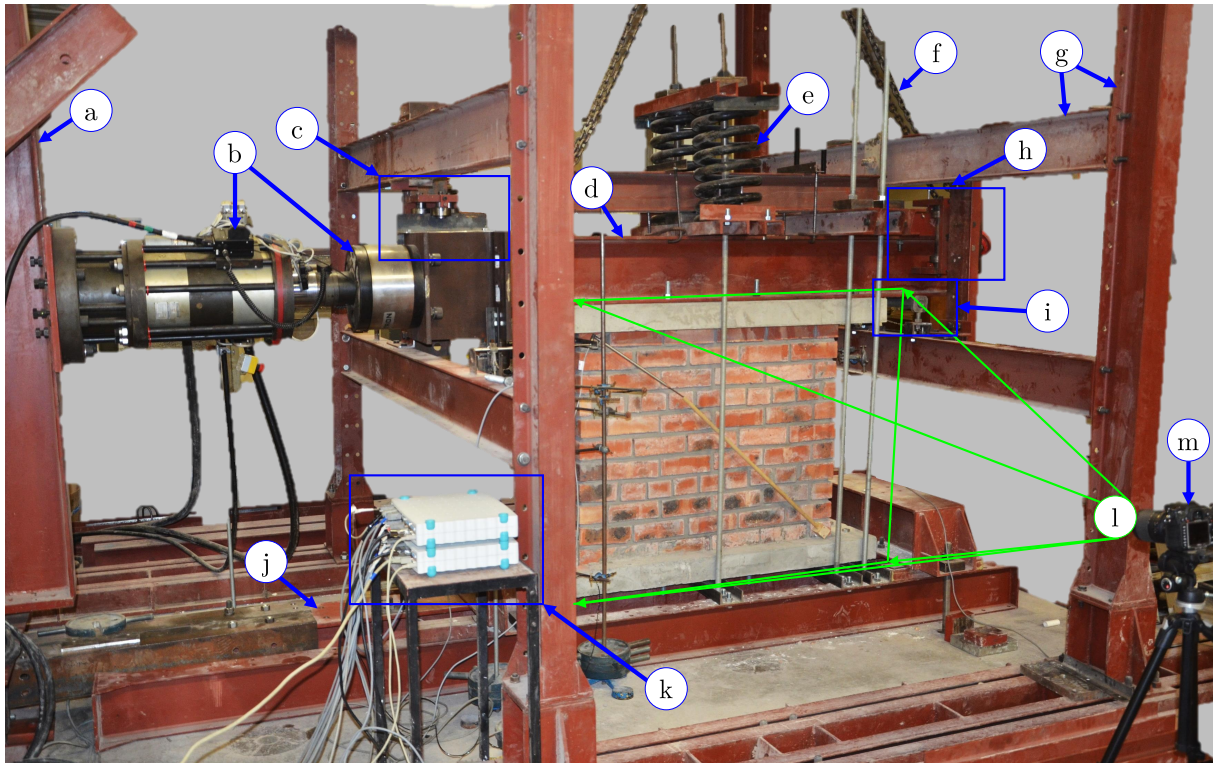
The manufactured SW test setup assembled with a wall specimen in place; (a) Instron A-frame column support; (b) Instron hydraulic actuator with 500kN LC attached; (c) Lateral support of Instron, see Figure 4.12a for detail; (d) Shear force spreader beam; (e) Coil springs; (f) Overhead crane chain attachments; (g) Lateral support frame; (h) Lateral support of shear force spreader beam, see Figure 4.12b for detail; (i) Vertical support roller, see Figure 4.14 for detail; (j) Bottom steel beam, that specimen connects to. (k) Spider 8 data acquisition system; (l) SWS and LVDT's positions, see Figure 4.15; (m) Digital camera.
